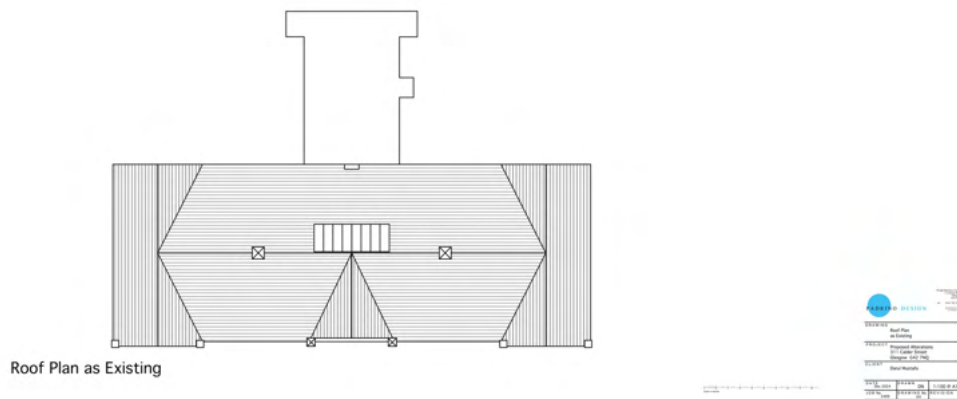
Roof Plan as Existing. Assessment relevance: Existing roof geometry used to understand the baseline massing condition. Source: Padrino Design drawing pack, job no. 2499, 311 Calder Street, Glasgow G42 7NQ.
